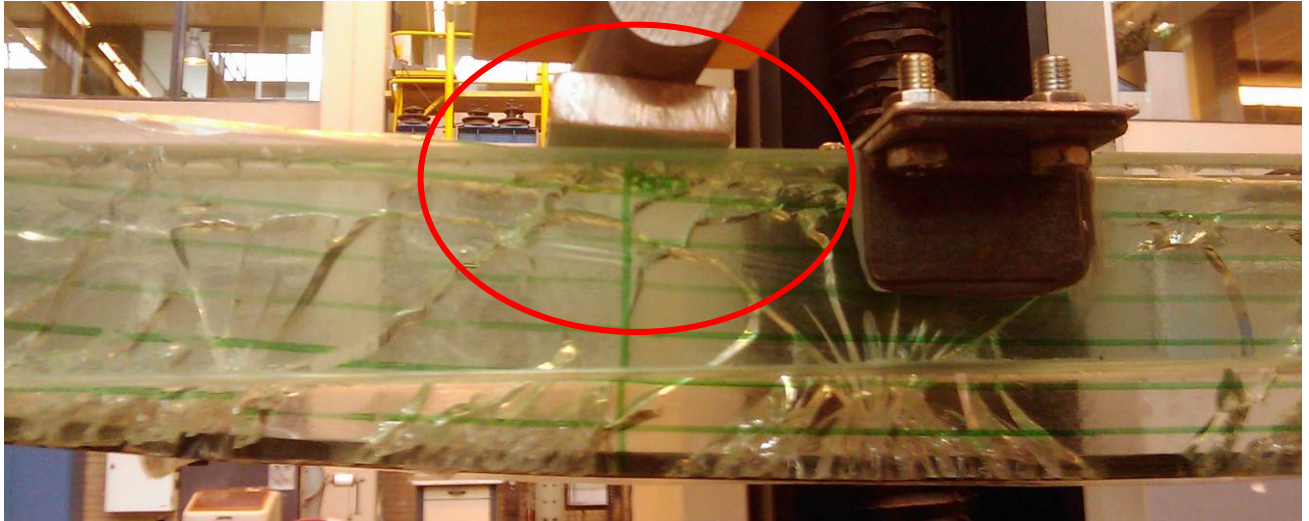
, Close-up of specimen 70-03 200mm left of the center of the girder. The cracks run up far in to the top of the girder under the support (encircled in red).
